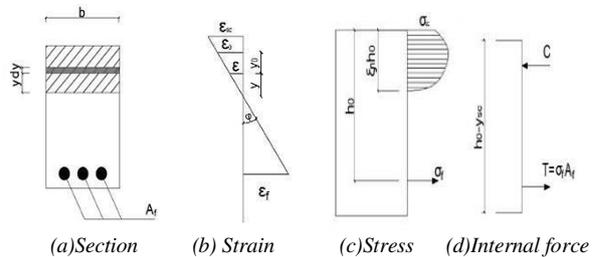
Internal force distribution of HFRP-reinforced SAP concrete beams
